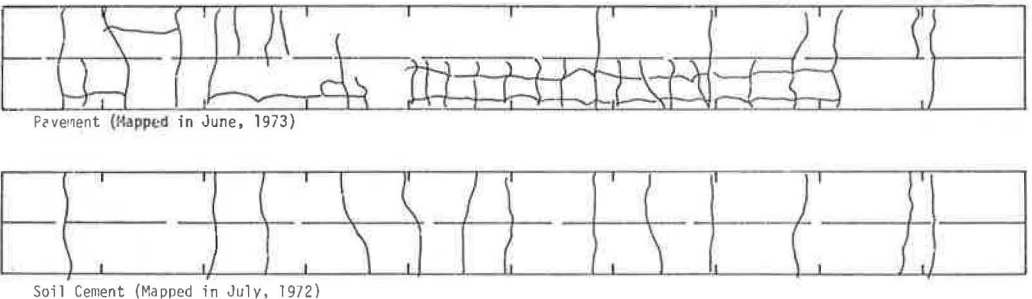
Cracking pattern of soil-cement base and superimposed pavement for experimental section with Type II cement (same as control section).
